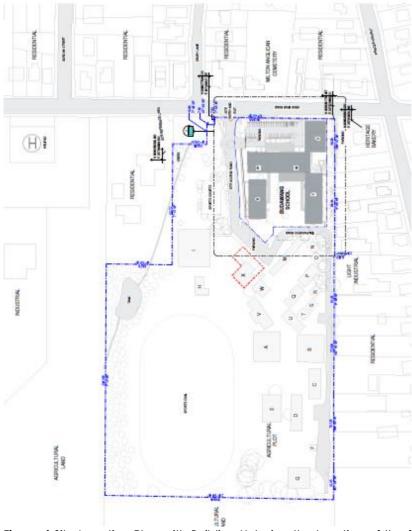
Site Location Plan with Building X, being the location of the future child care centre, outlined in red (subject to separate DA). Source: Group GSA
